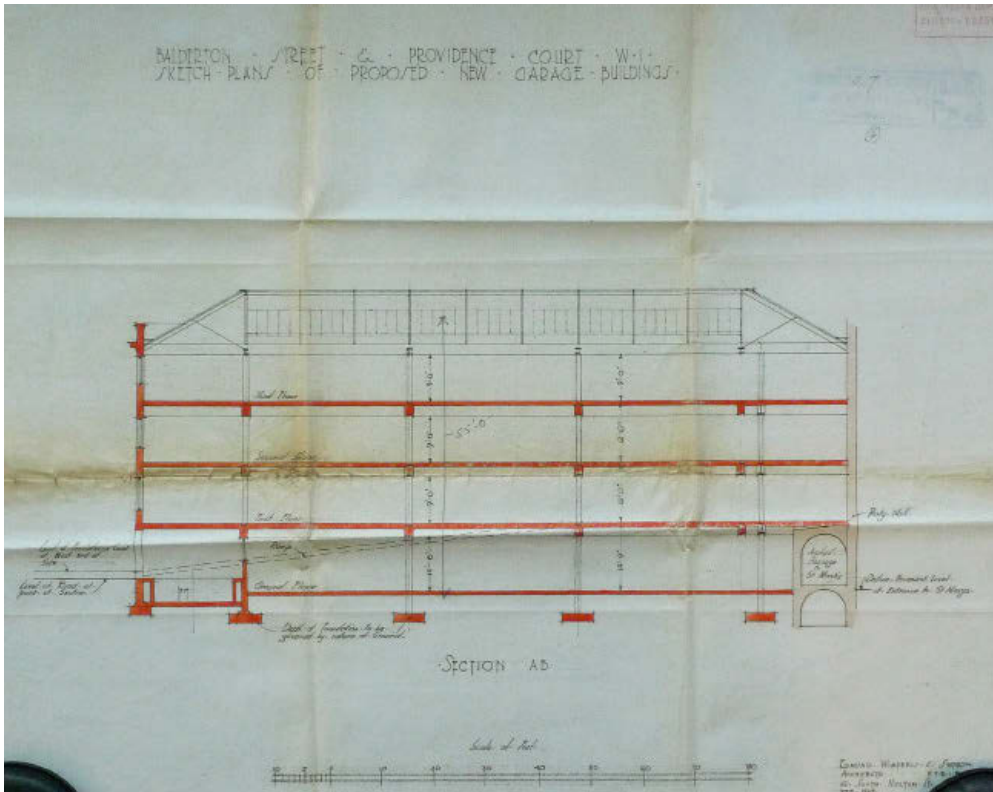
Architect's section from south to north, looking west, 1925 (Heyne Tillett Steel 2009)
